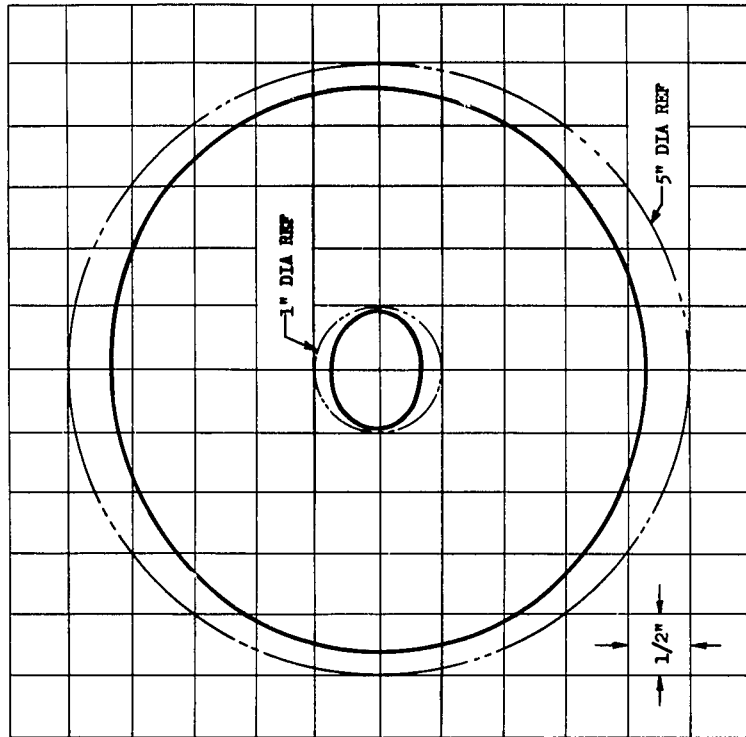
Cross Section at Center of Cylinder From Right Side of Tower 1
